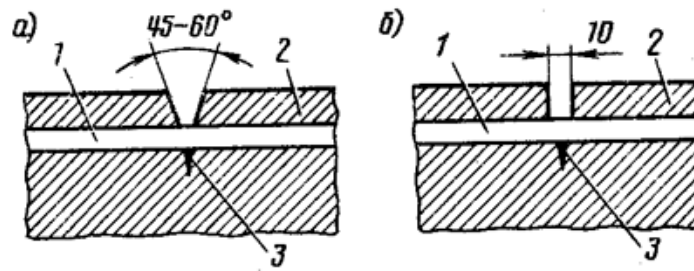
Diagram of crack opening: 1 - reinforcement core; 2 - concrete protective layer; 3 - crack.
